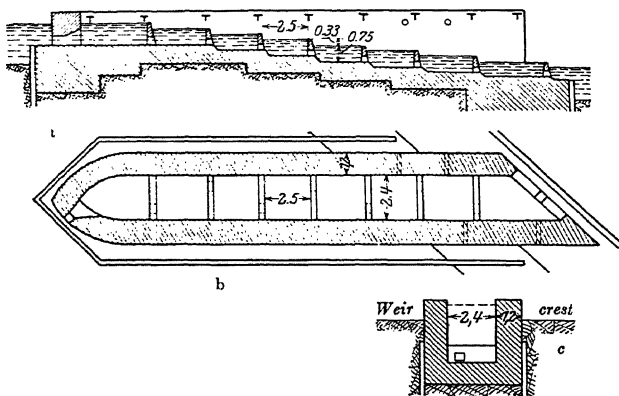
a to c. Fish-pass layout at Bremen (Hemelingen)
